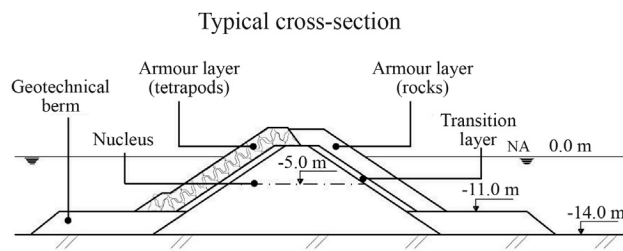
Layout of a typical cross-section of the Rio Grande breakwater.
